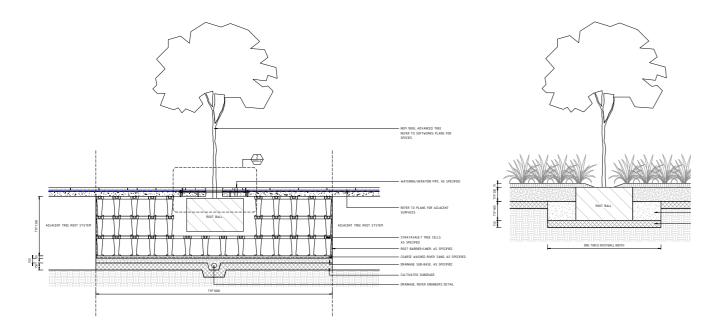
Typical planting details Source: Arcadia Landscape Architecture
